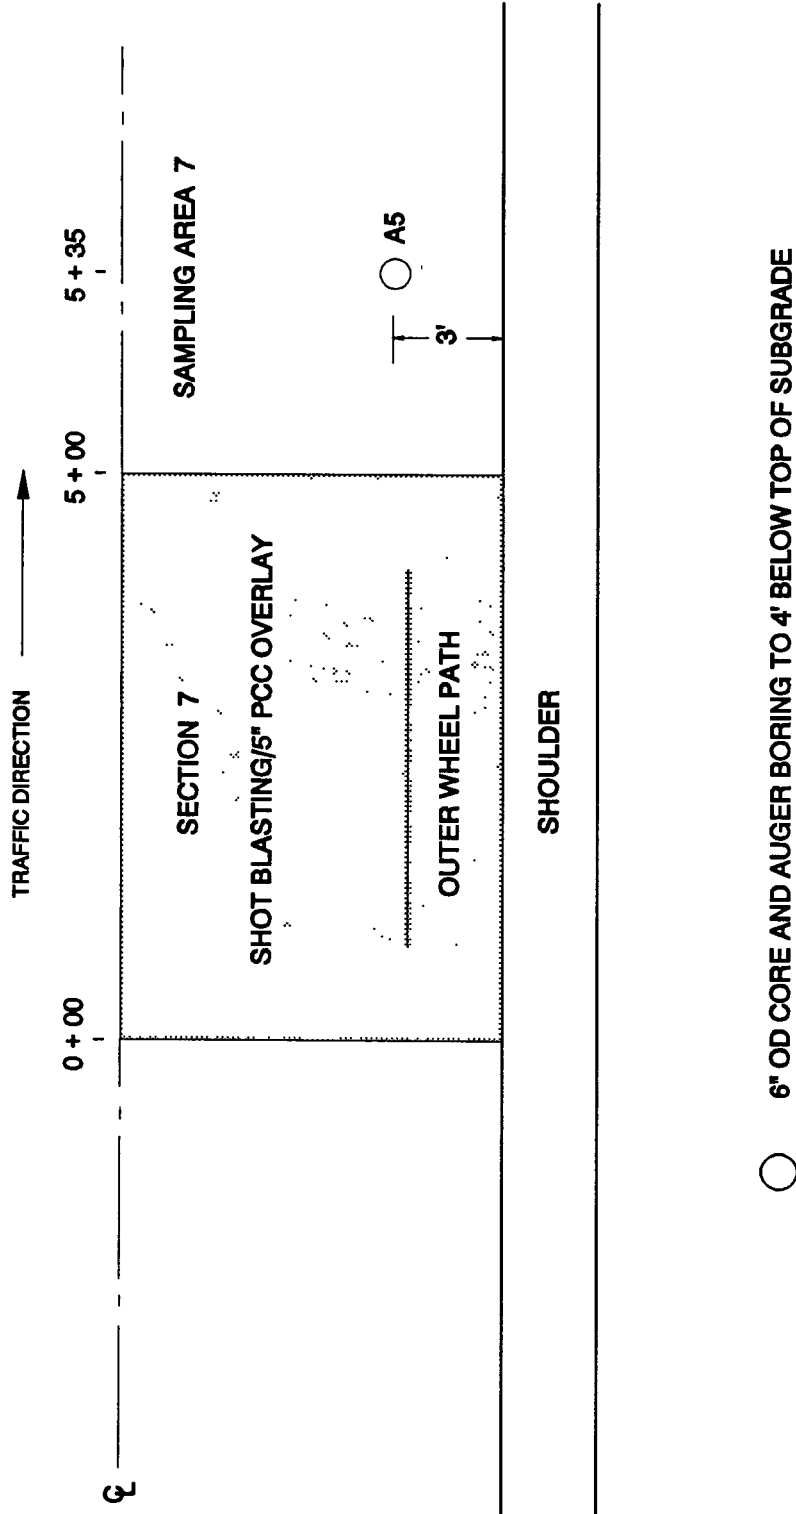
Example of "Pre-Construction" Sampling Plan for Test Section 7
